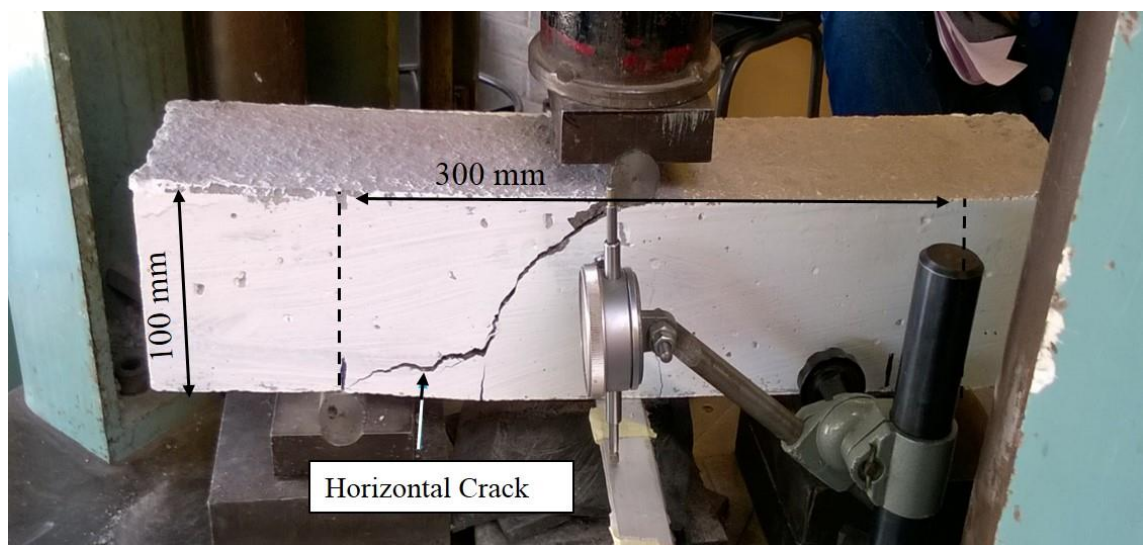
Failure of the GFRP beam specimen with the horizontal bond crack
